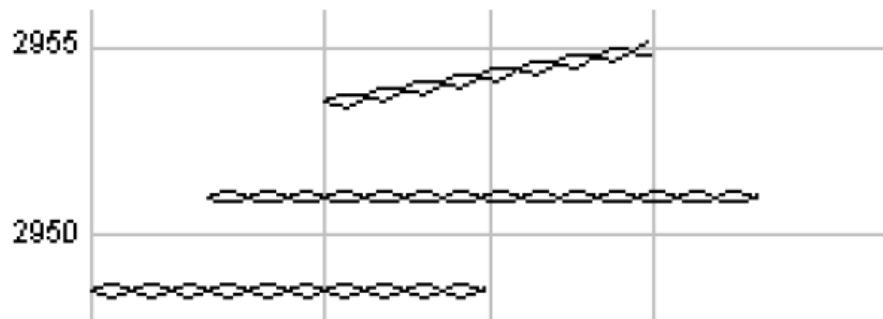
Steel straps shown in a schema in unfolded perspective in Novapoint Tunnel
